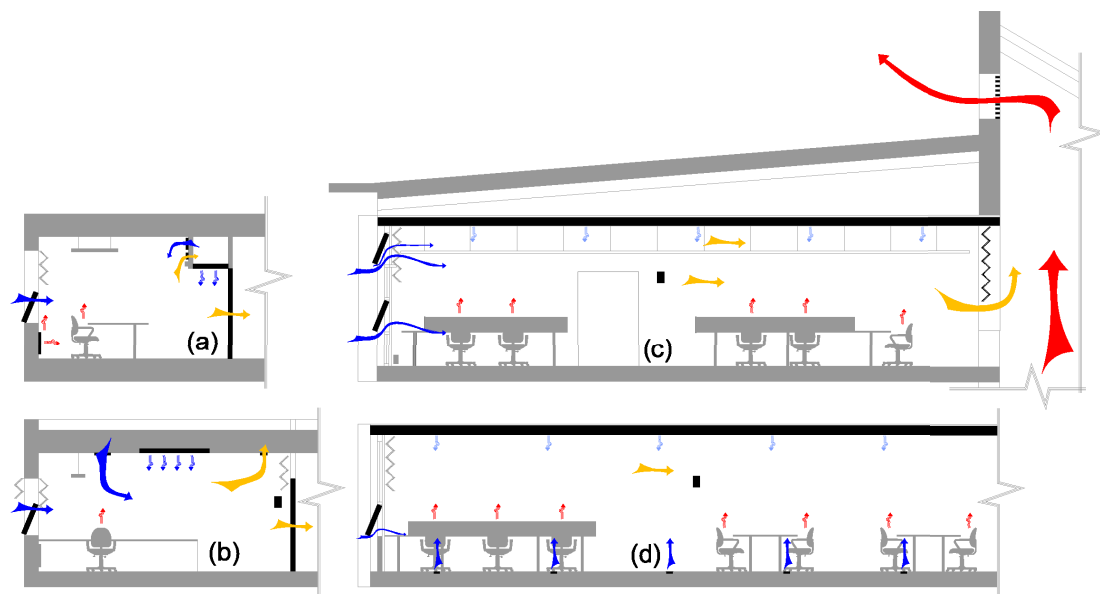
Sections, summer day ventilation in in (a) and (b): Norwegian cellular plan offices and (c) and (d): British open plan offices
